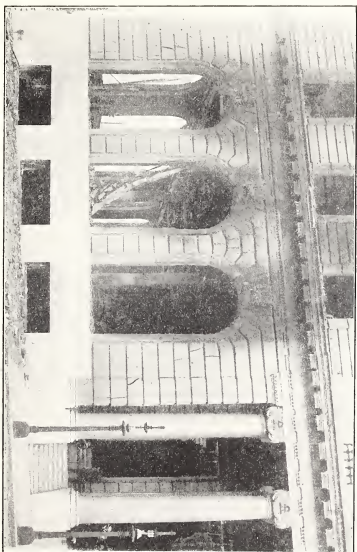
St. Francis Hotel, Southeast Corner, Showing Heavy Earthquake Cracks in the First Story of the Southstone Front.
